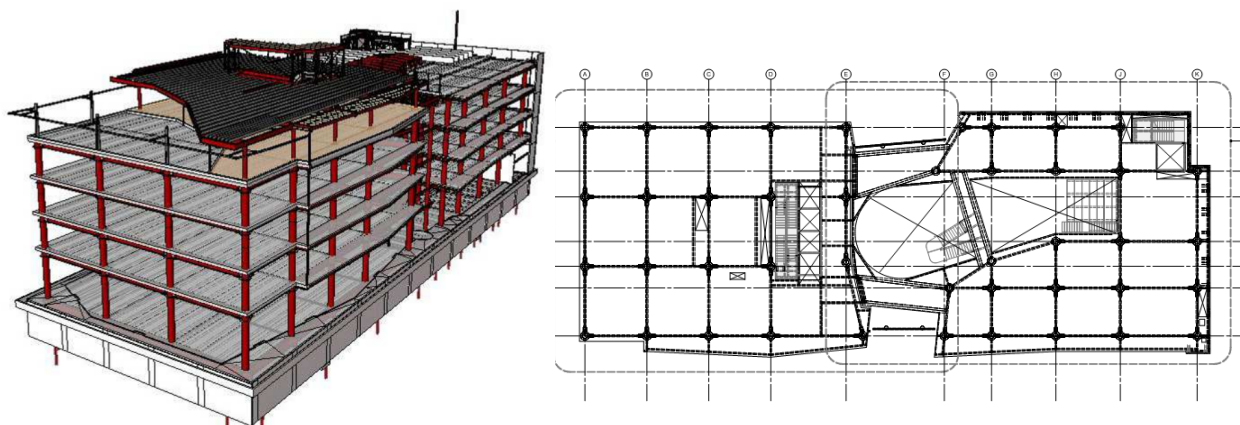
(a) 3D rendering of the office building (b) typical structural framing plan
